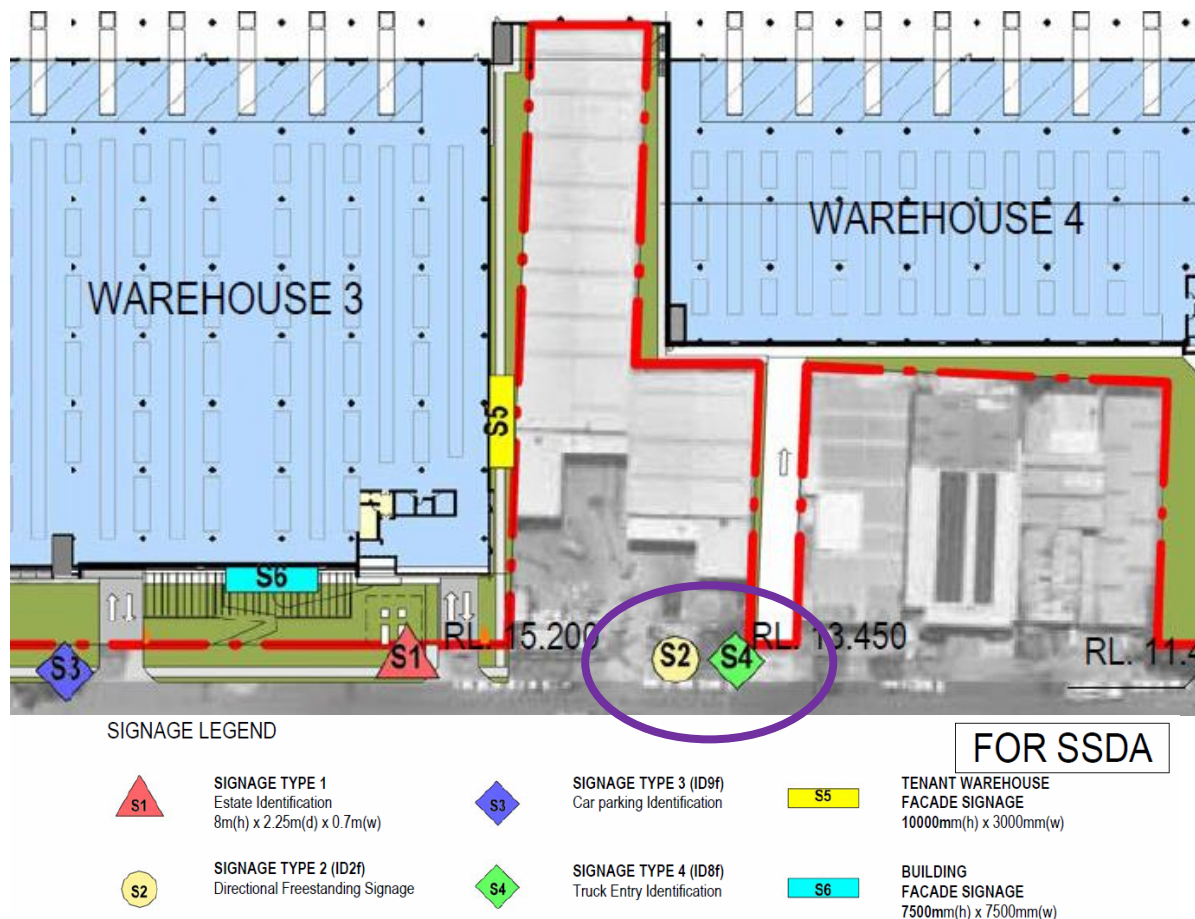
Drawing No. PML-NT-AR-DA431 Issue 3 (Source: Nettletontribe Architects)
